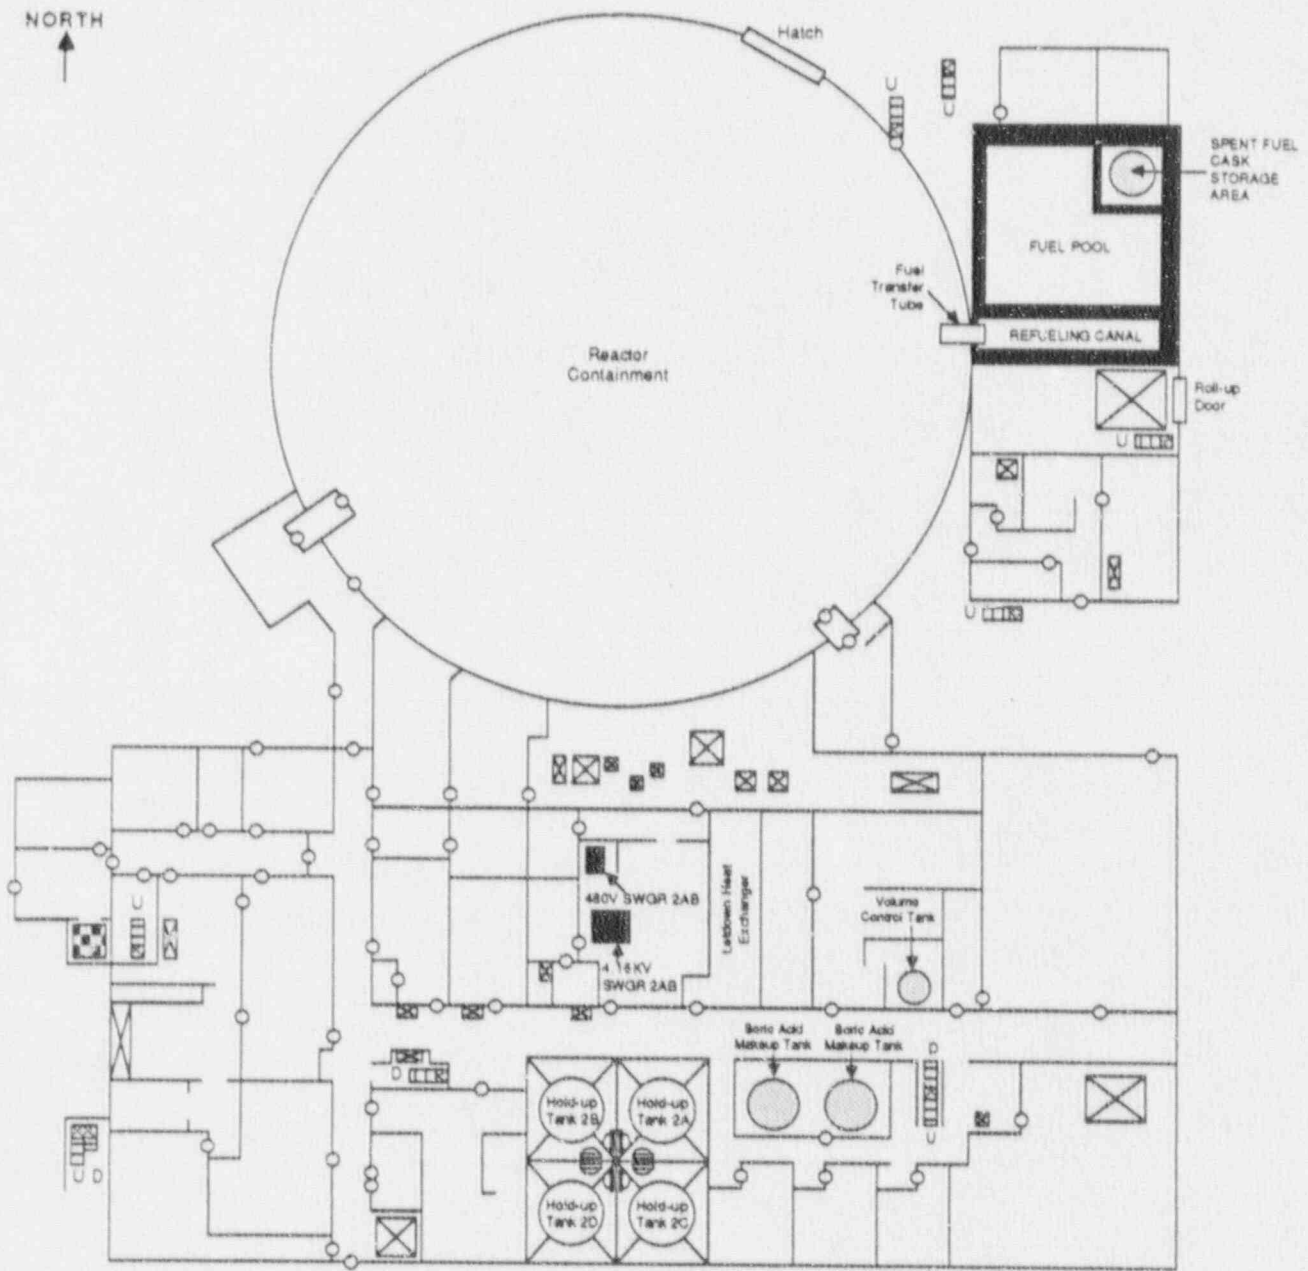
St. Lucie 2 Reactor Building, Elevation 18', Auxiliary Building, Elevation 19.5', and Fuel Handling Building, Elevation 19.5'
